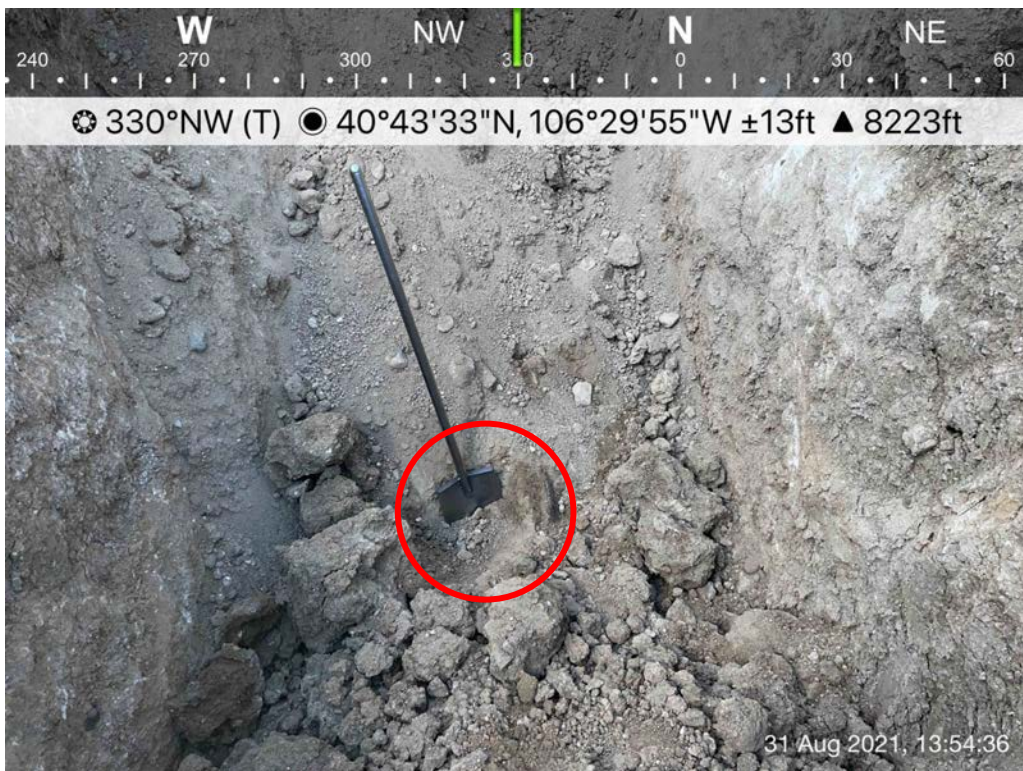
SS02, collected from base of flowline excavation, Margaret Spaulding (OWP) #2, 8/31/2021.
